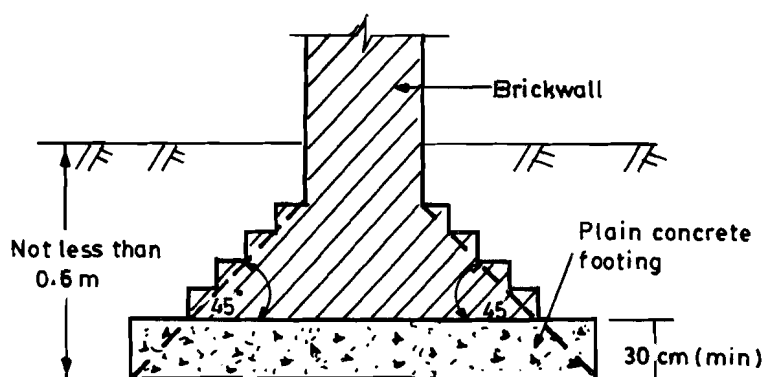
Plain Concrete Footing for a Brick Wall
